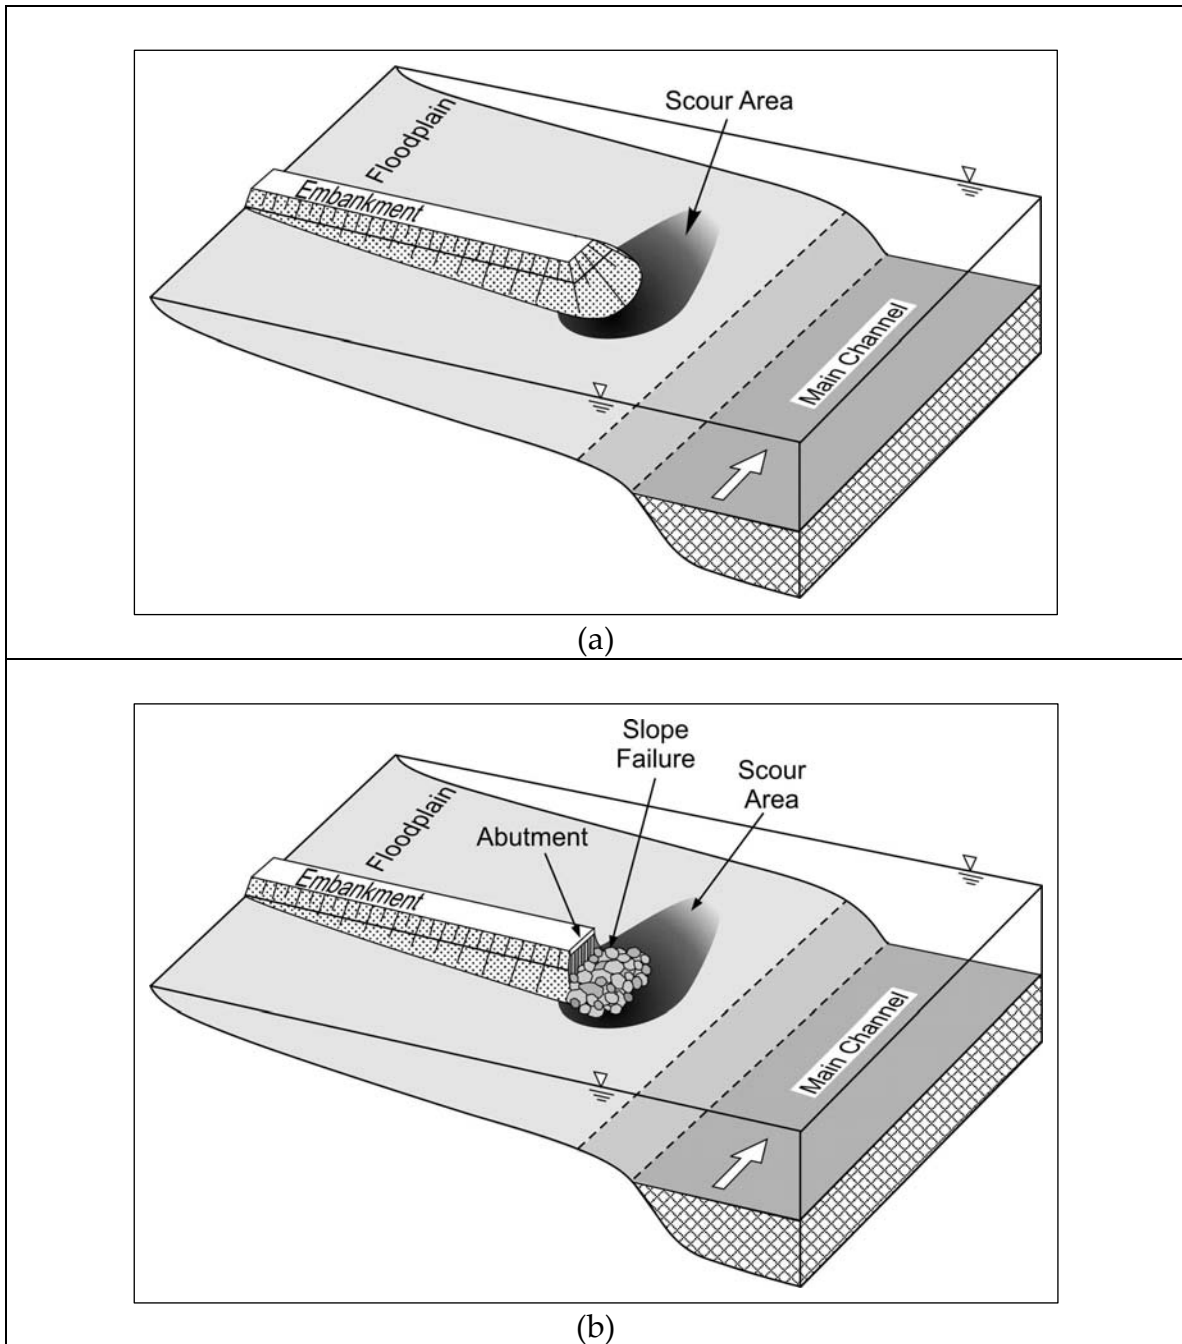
The several stage collapse process associated with a further common condition of scour at a spill-through abutment in a compound channel: (a) hydraulic scour of the floodplain causes (b) a failure of the face of the abutment embankment. In this condition, the floodplain is as erodible (more or less) as is the bed of the main channel. The collapse of the embankment soil (and armor protection) into the scour hole modify the scour area.
